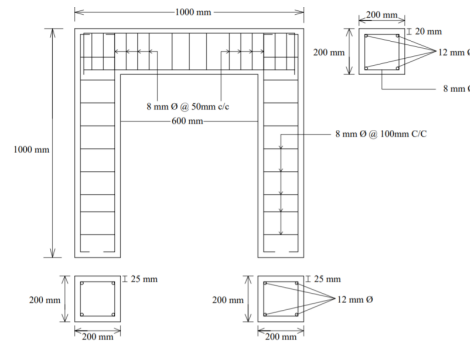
Reinforcement details of the single bay single storied frame specimen
